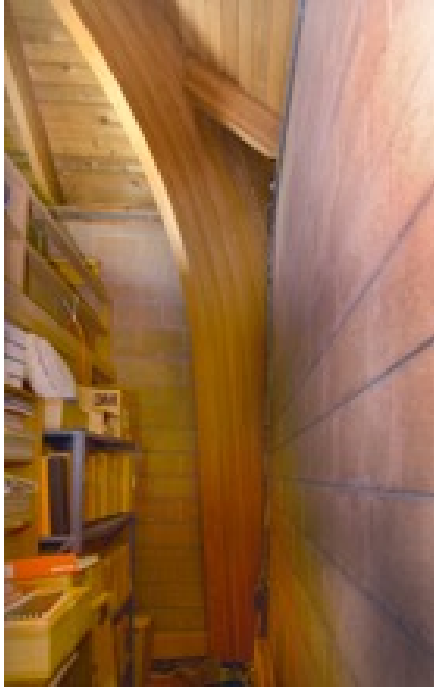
View of laminated fir arch at corner of studio. Camera facing northeast.
